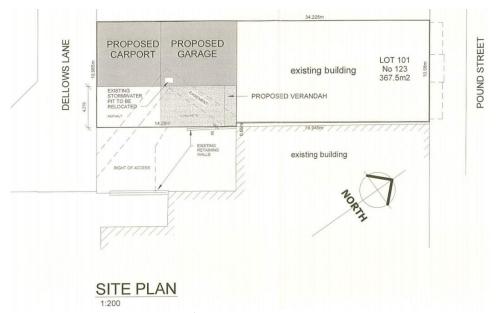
Site Plan DA2019/0298 showing proposed garage and carport
